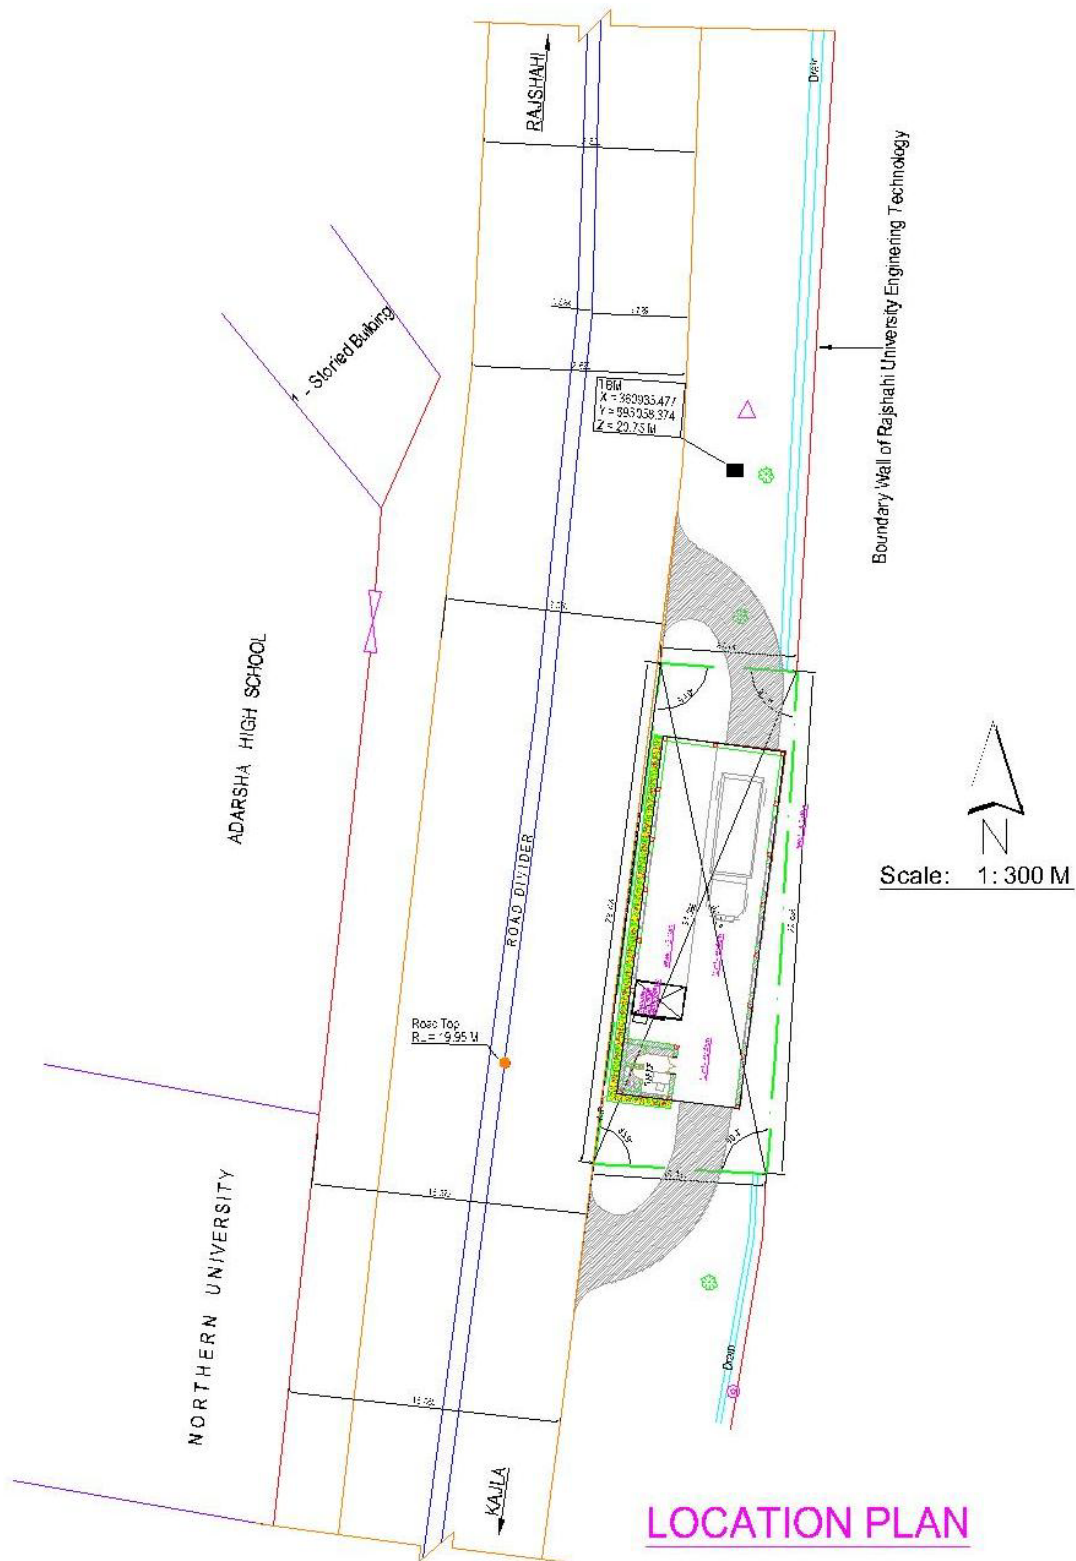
STS – 4 Rashik Composting Plant Layout Plan(24°23'28"N, 88°35'16"E)
